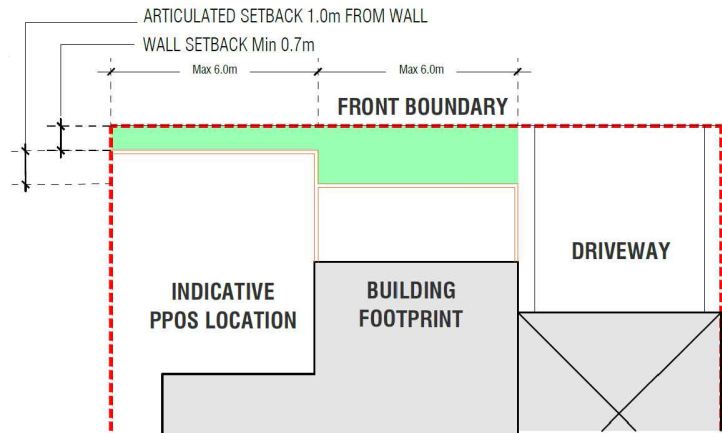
EXAMPLE - COURTYARD WALL, SHOWING ARTICULATED PLANTING ZONE SETBACK
